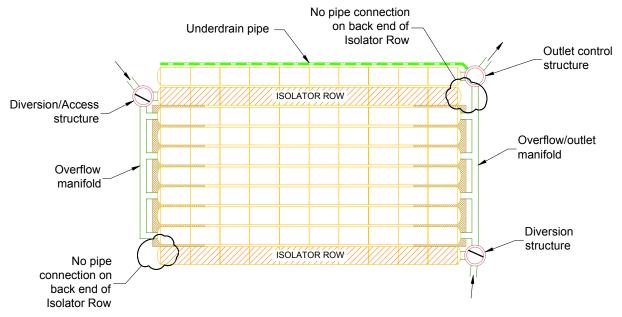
Typical StormTech Chamber Layout with Isolator Row
